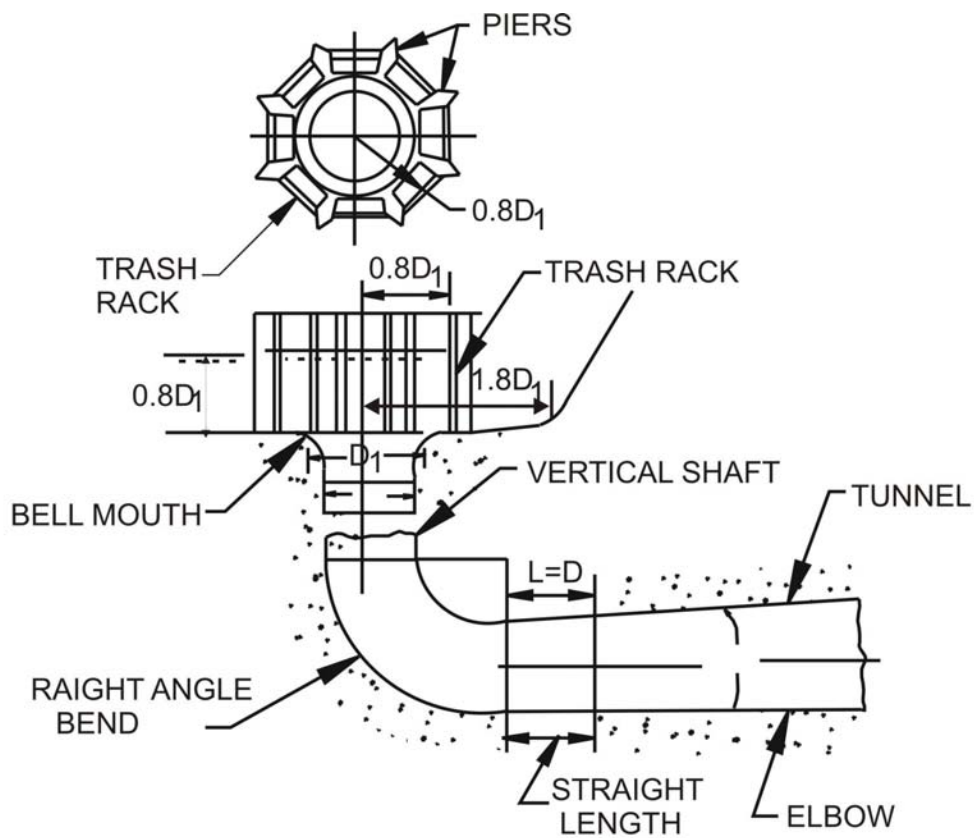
TYPICAL INSTALLATION IN AN EARTH DAM OF TOWER TYPE INTAKE
